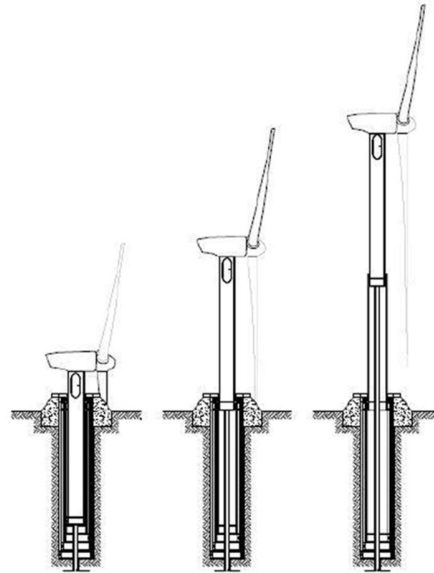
Hydraulic cylinders used to lift telescopic towers (Campione et al., 2021)
